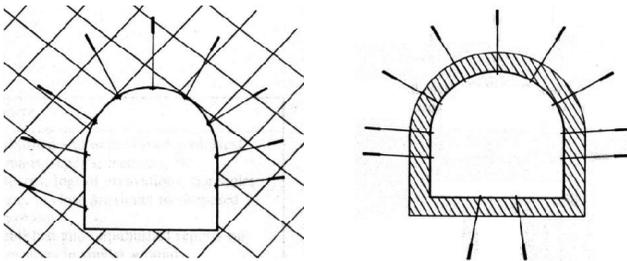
Building up Arch/Ring and Controlling Yielding
